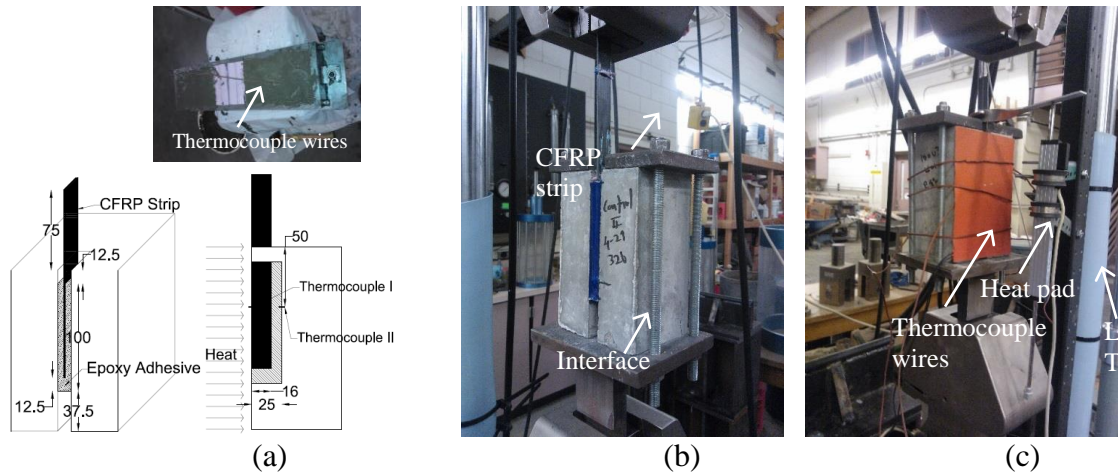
Thermomechanical test for NSM CFRP-concrete interface: (a) dimensions and thermocouple positioning (unit in mm [1 mm = 0.0394 in]), (b) control specimen, (c) heated specimen
